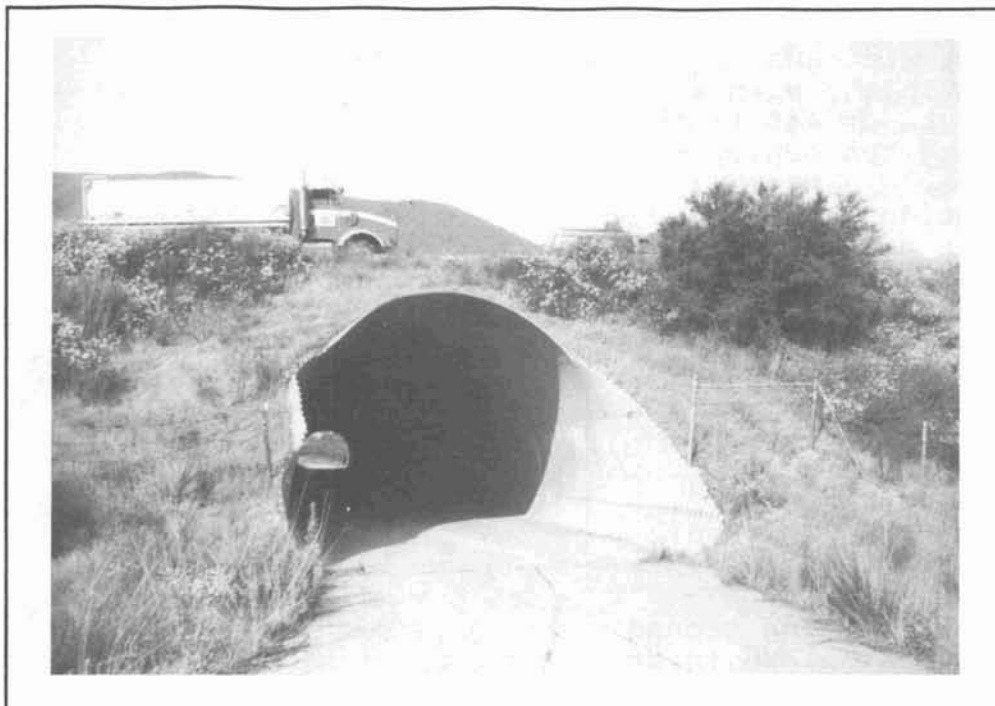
I-15 Arch Bridge Over Matthews Rd.
